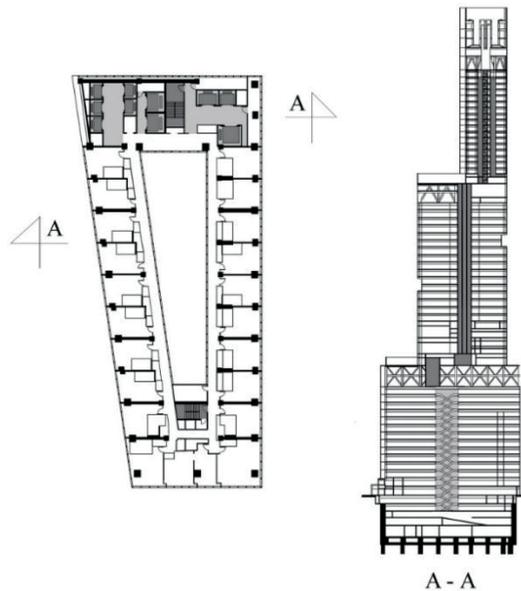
Abeno Harukas: floor plan of the 53 and section, developed by authors [9]
